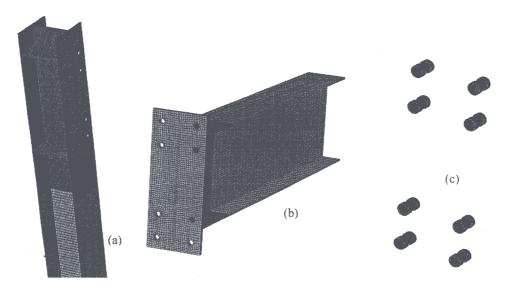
Structural parts of the connection (a) column, (b) beam and (c) bolts
